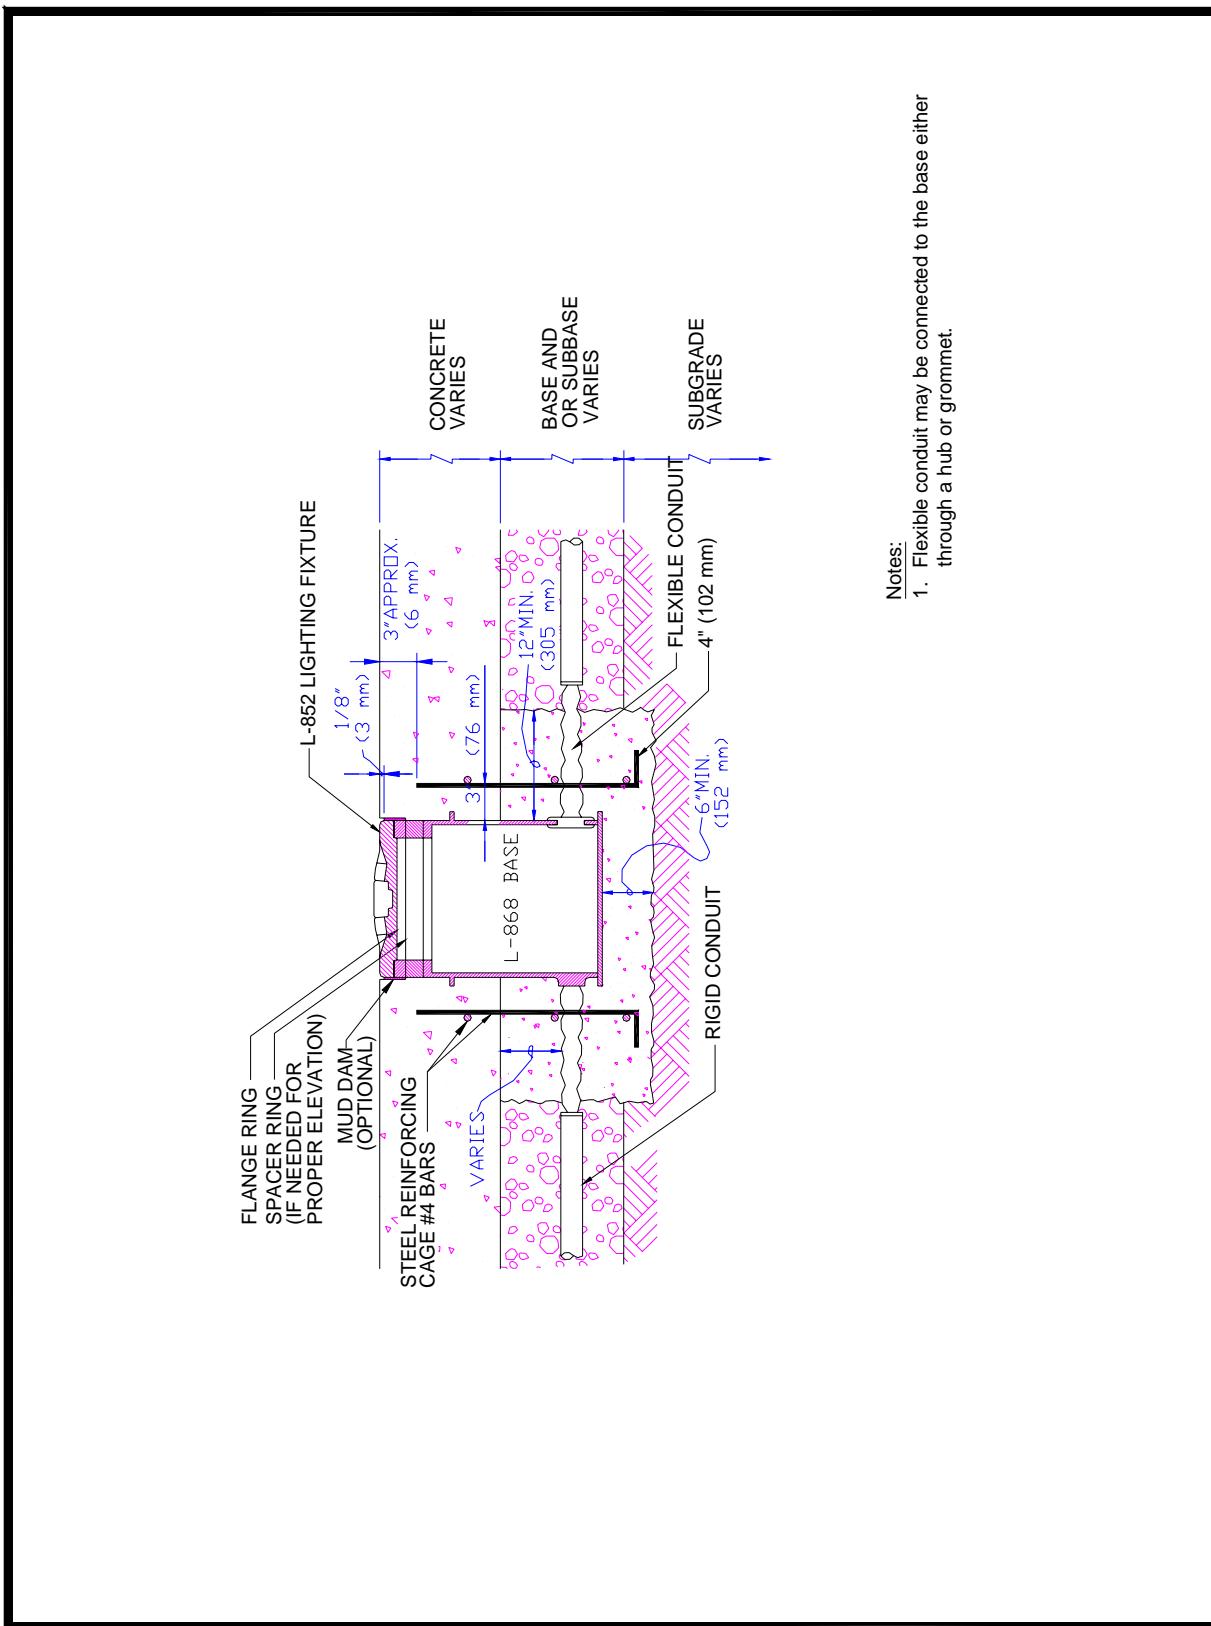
Section Through Non-adjustable Base and Anchor, Base and Conduit System, Rigid Pavement
